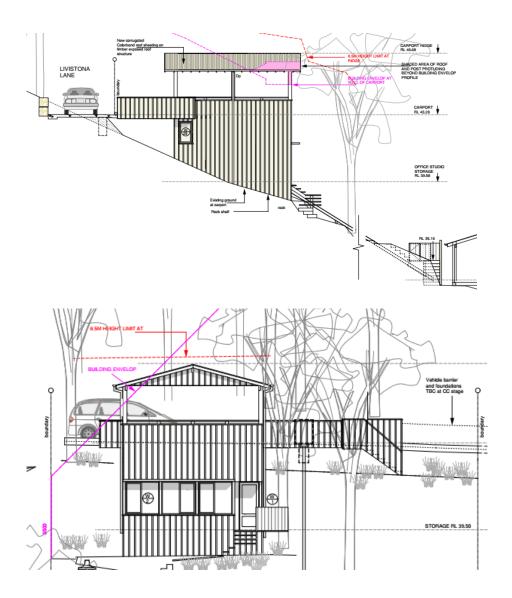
showing area of roof and eaves projecting beyond the building envelop
